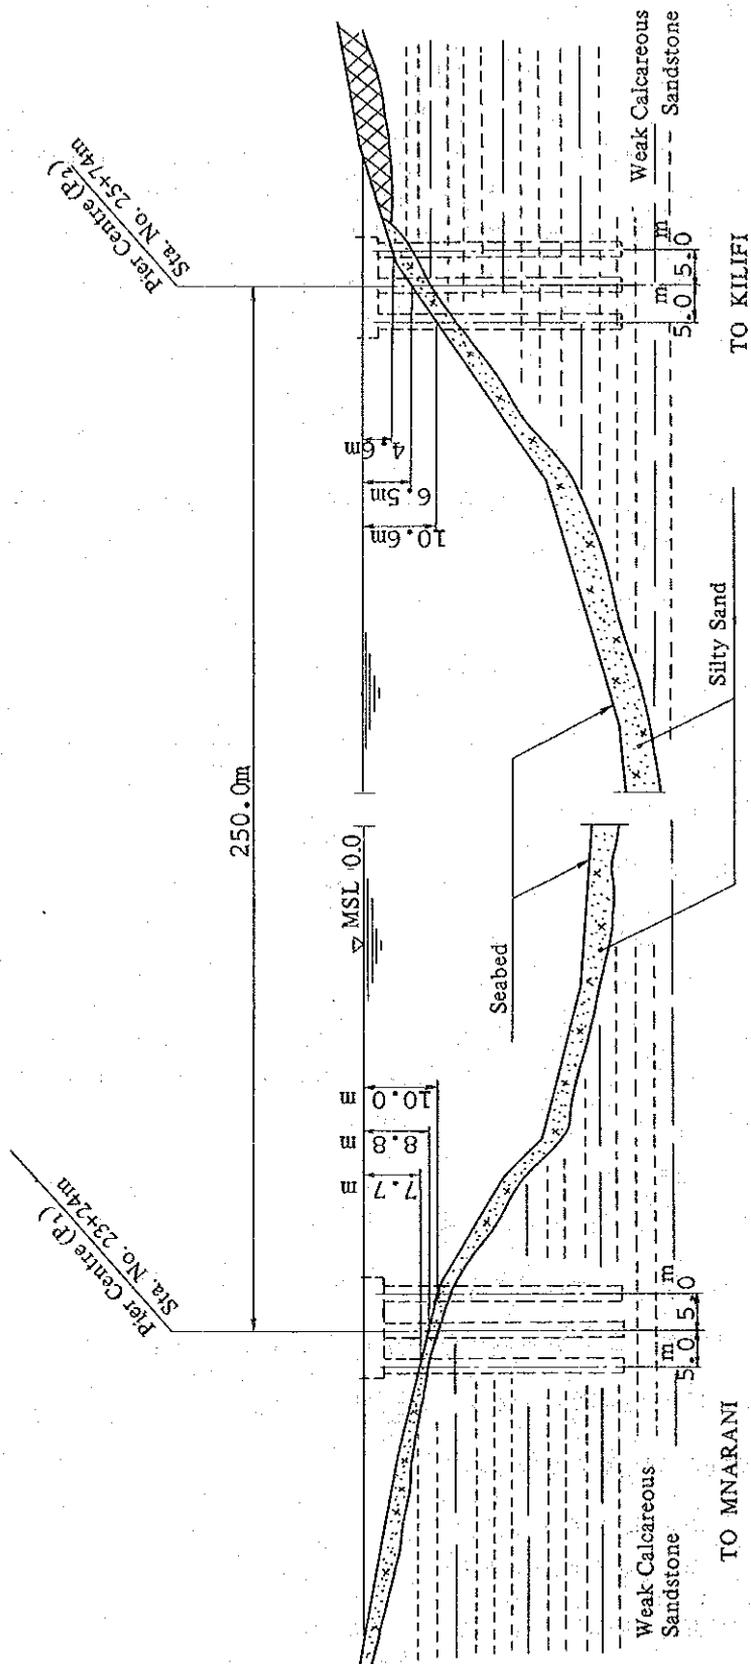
PROFILE AND SUBSURFACE CONDITION OF SEABED AROUND PIERS
